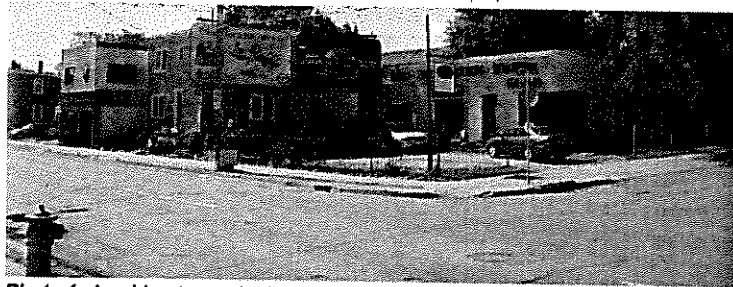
Looking towards the site from the east side of Gottingen Street. The site includes the green building behind the billboard to the left of the photo, the commercial building in the center, and the first residential lot on the south side of Macara Street.
